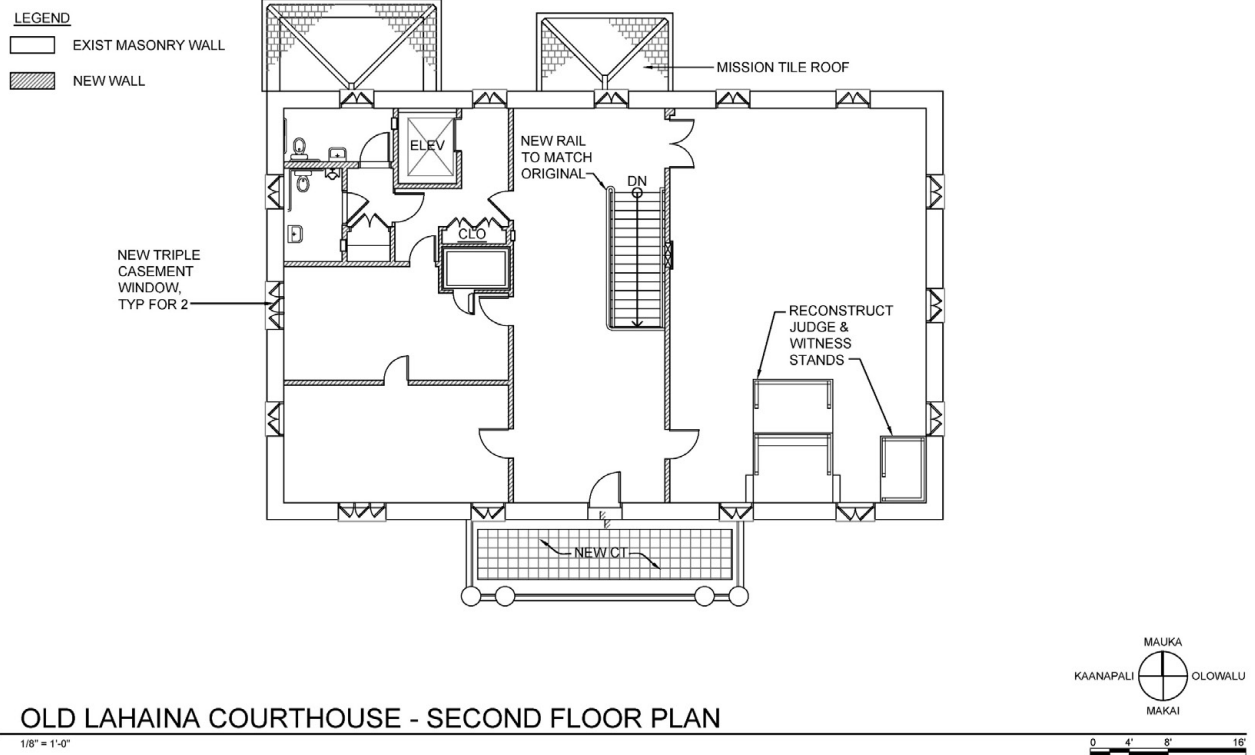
Old Lahaina Courthouse Second Floor Plan.
